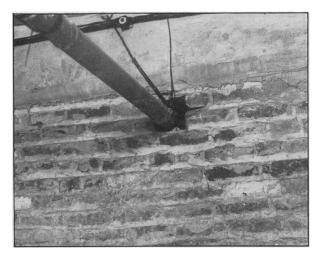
DEFECTIVE AND BROKEN WALL.
